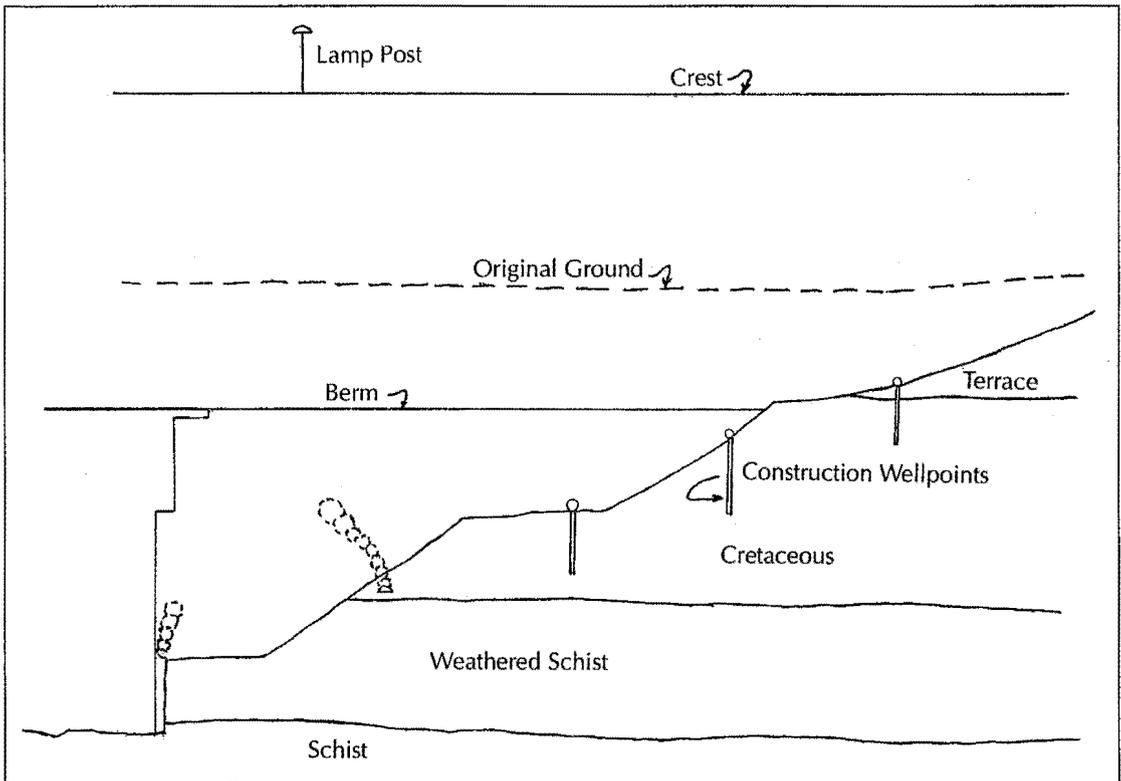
Longitudinal section through the east end of the Walter Bouldin power house and the junction with east wing dam.
